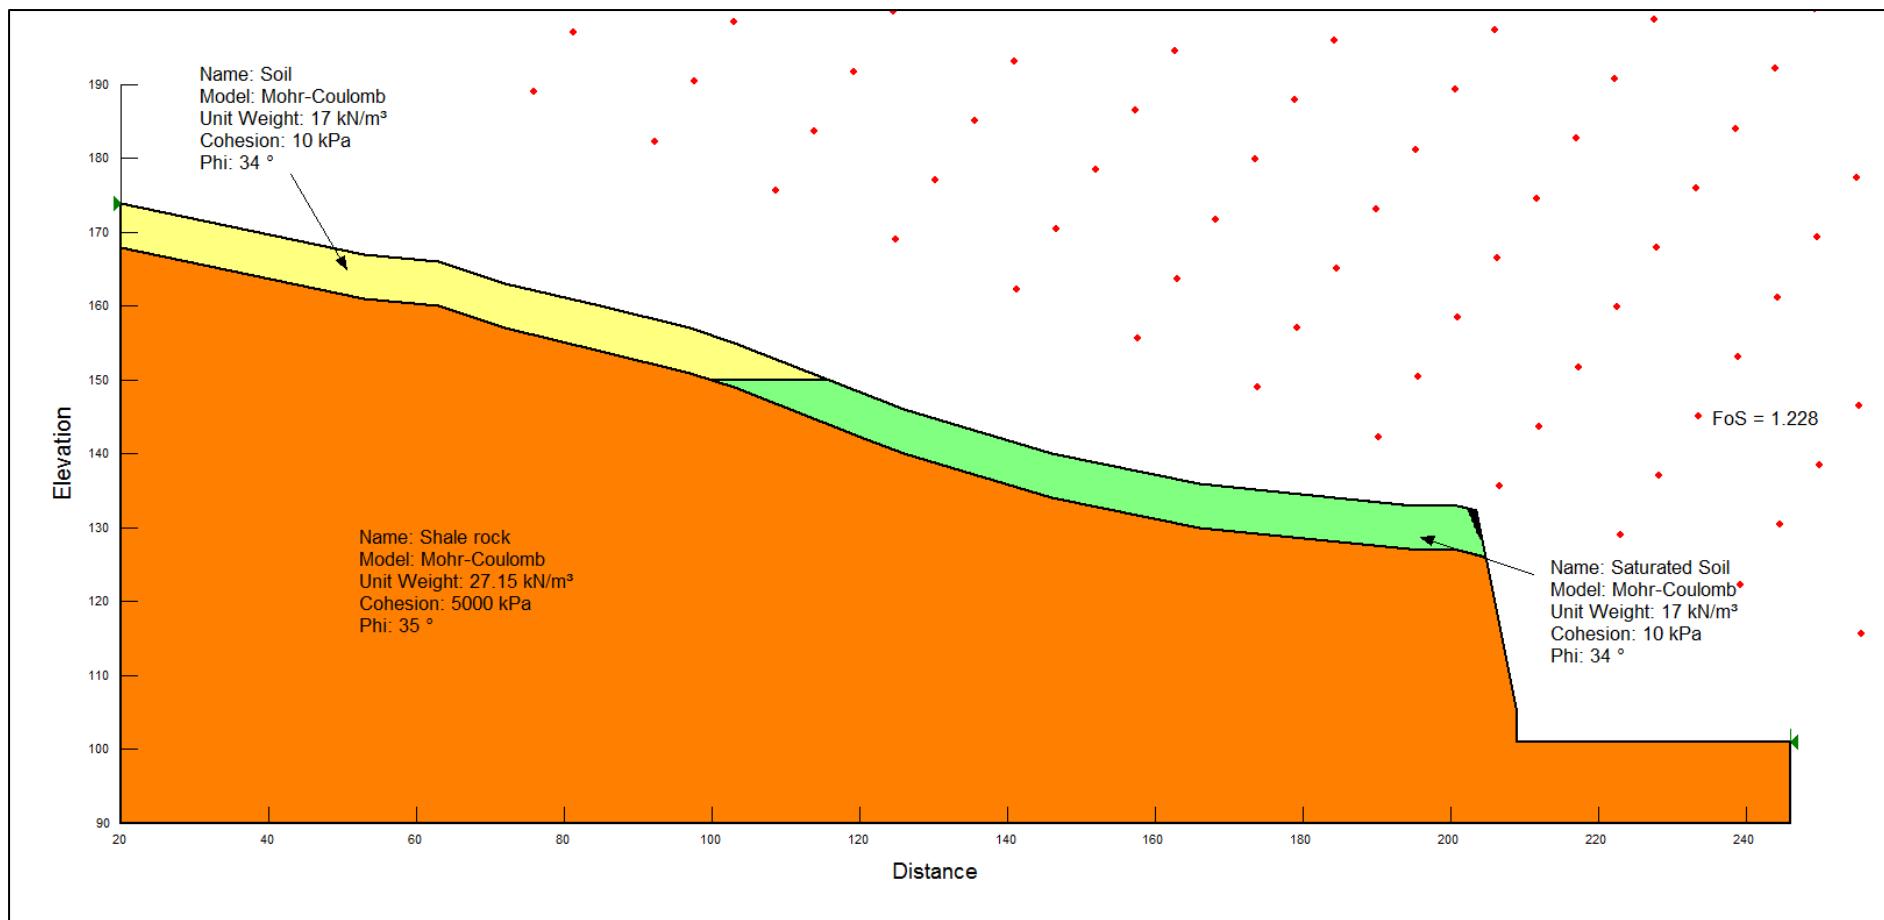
E.11: Inlet portal, Section 2, 1:0.2 excavation slope in shale, 1:2 excavation slope in soil
